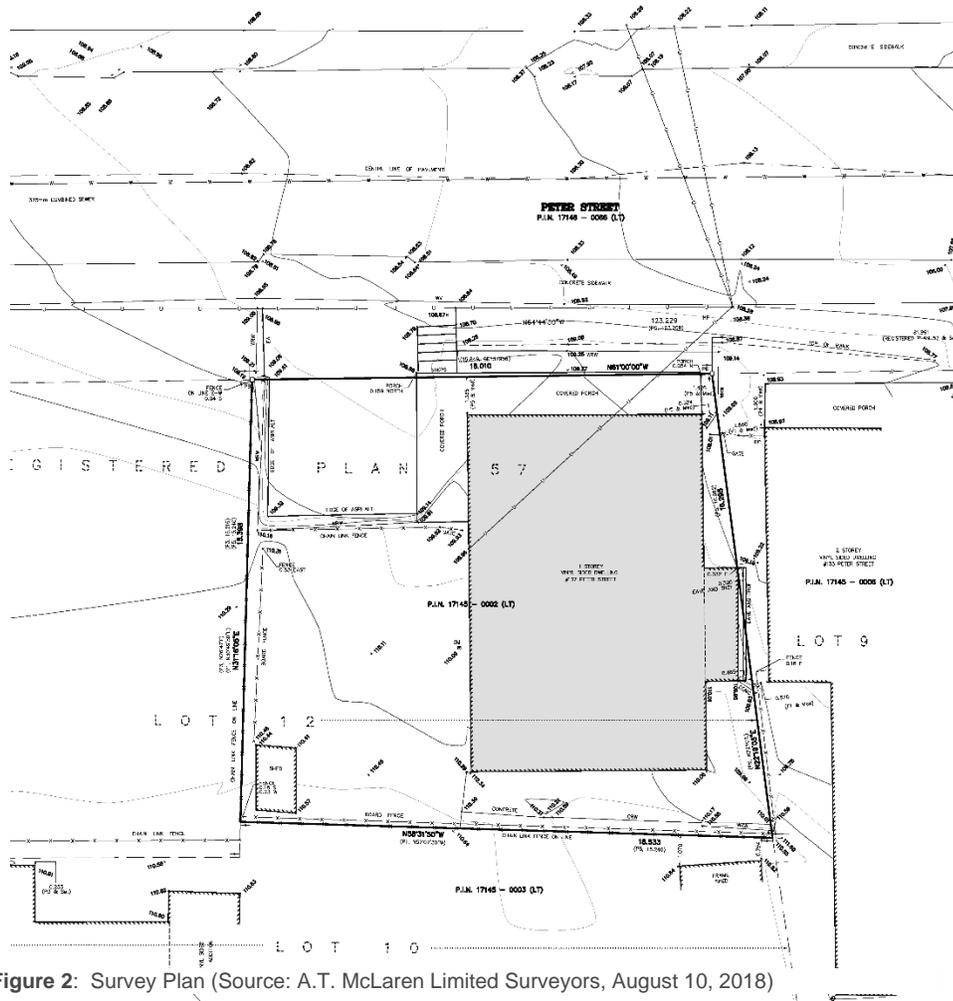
Survey Plan (Source: A.T. McLaren Limited Surveyors, August 10, 2018)
